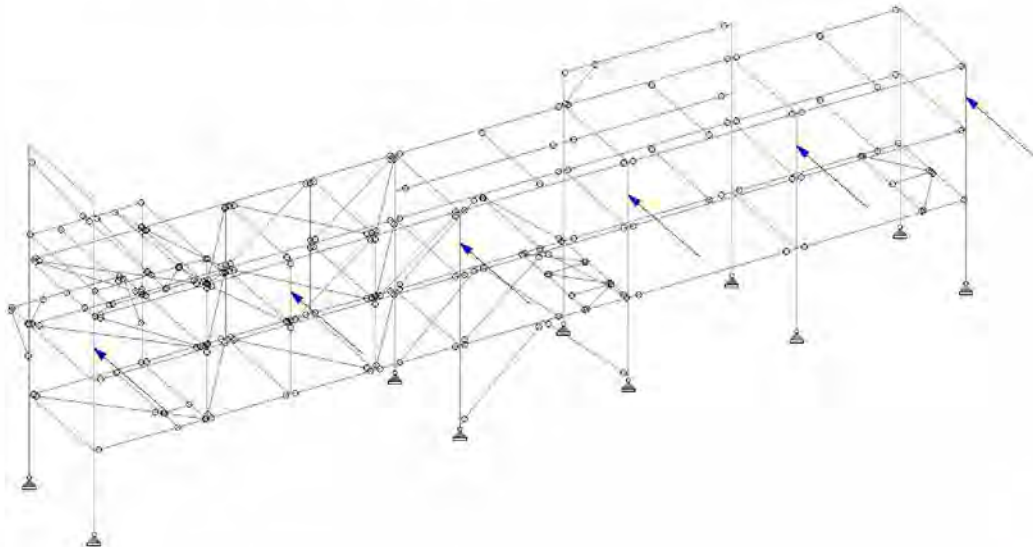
Wind load on structure due to piping (in -Z direction)
